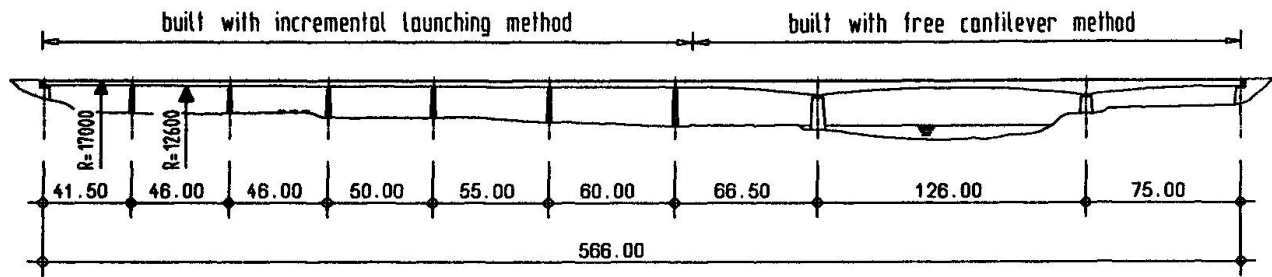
Elevation of structure of Main Bridge Retzbach-Zellingen
